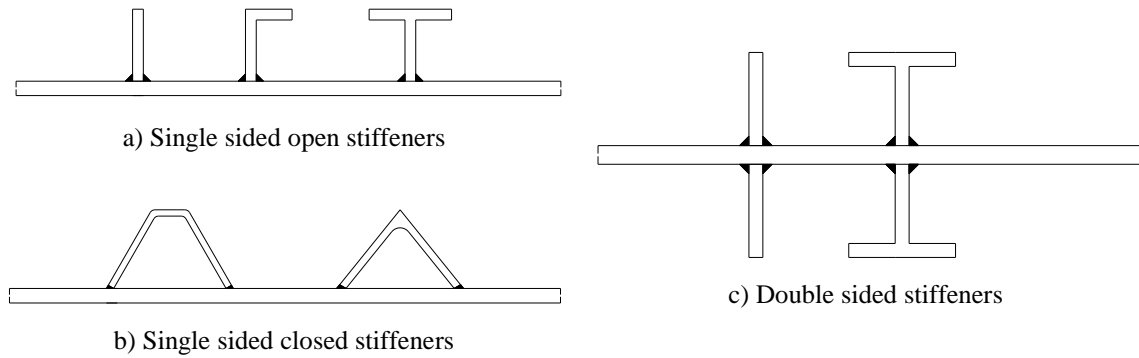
Typical cross-sections of stiffeners (Beg et al., 2010)
